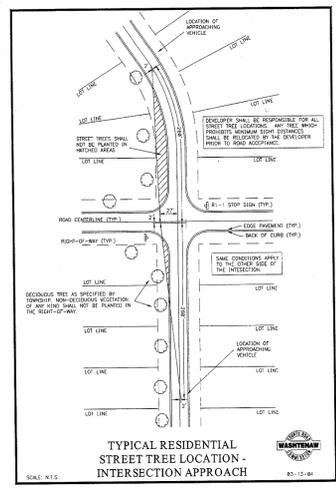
Typical Residential Street Tree Location, Intersection Sight Distance
